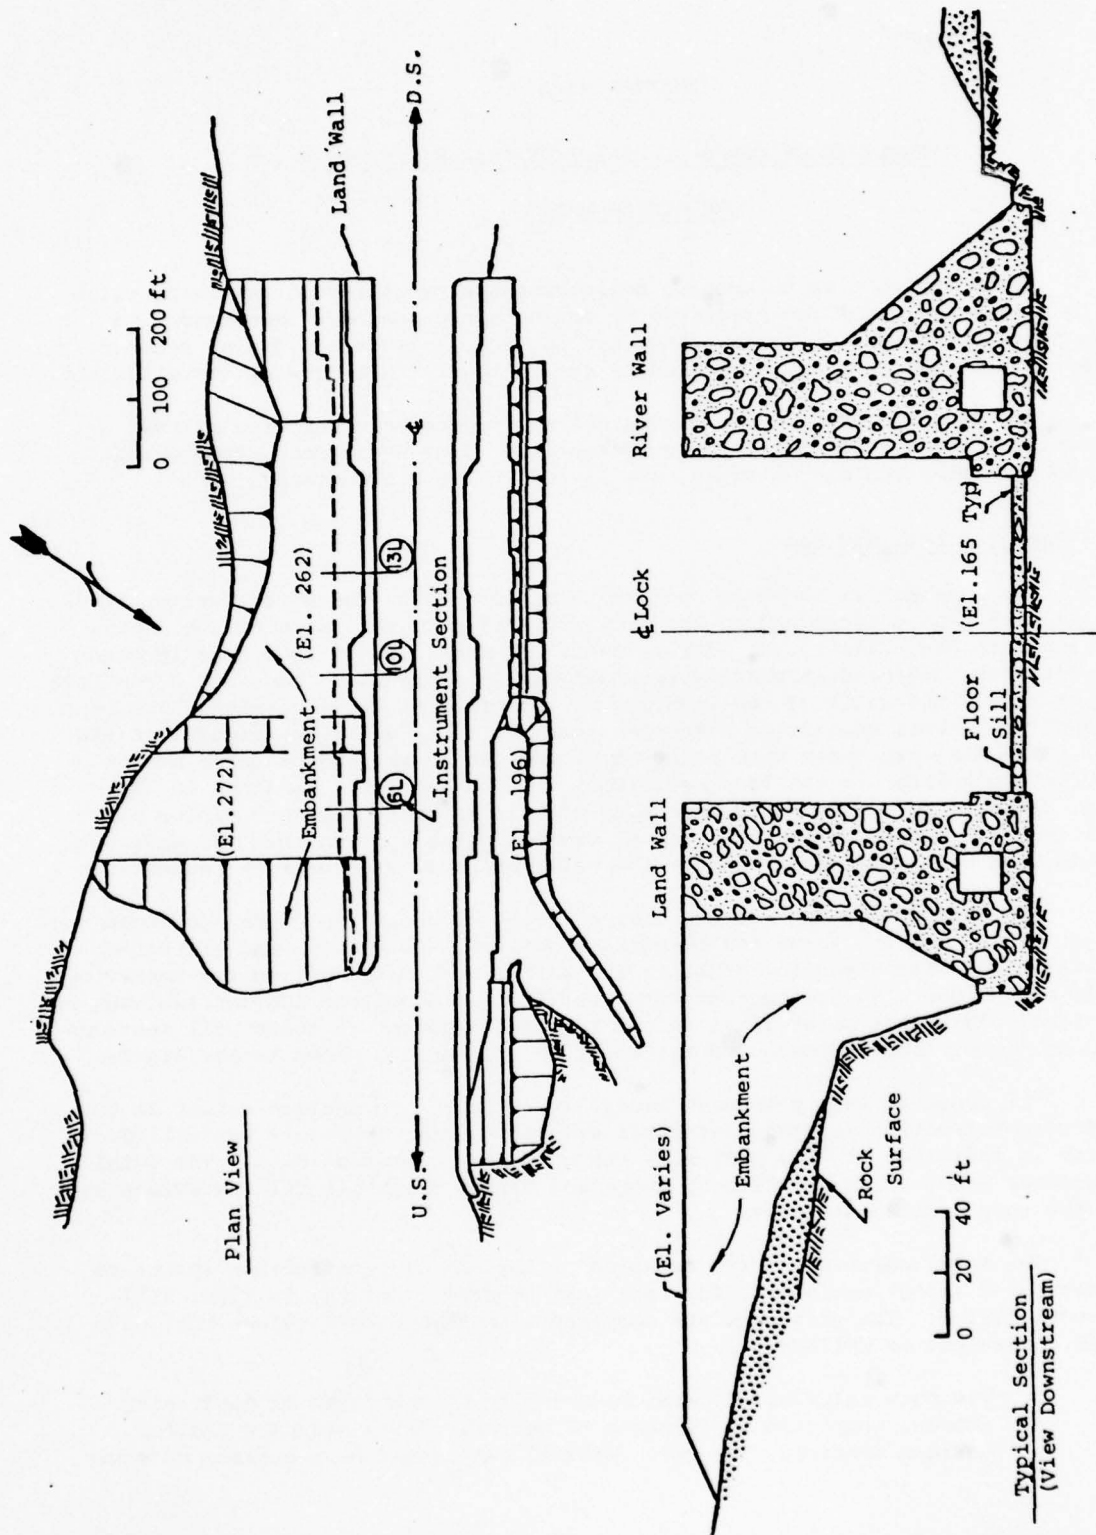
PLAN AND SECTION VIEWS OF BANKHEAD LOCK AND DAM
